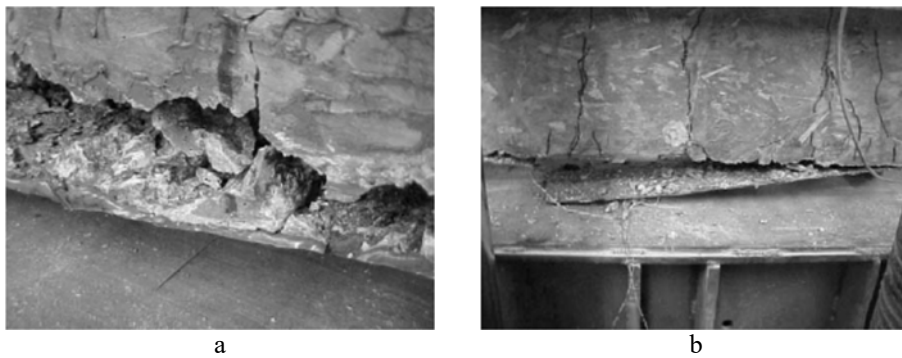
Failure of SRG strengthened reinforced concrete beams. SRP (a), SRG (b) [Huang et al., 2005]
